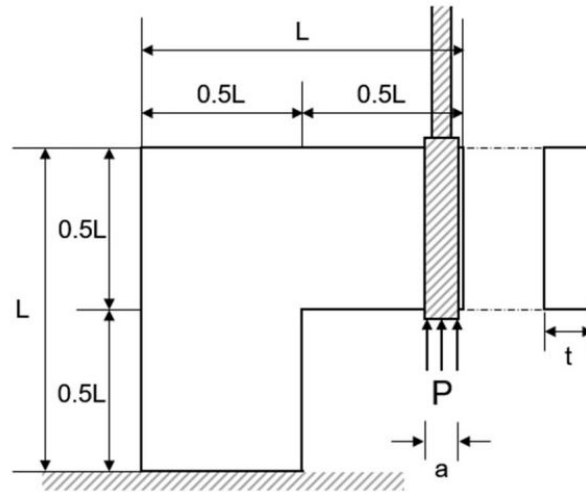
Geometry and loading conditions for the L shaped panel test [33]. The dimensions tested were $L = 500$ mm, $t = 100$ mm and $a = 40$ mm.
